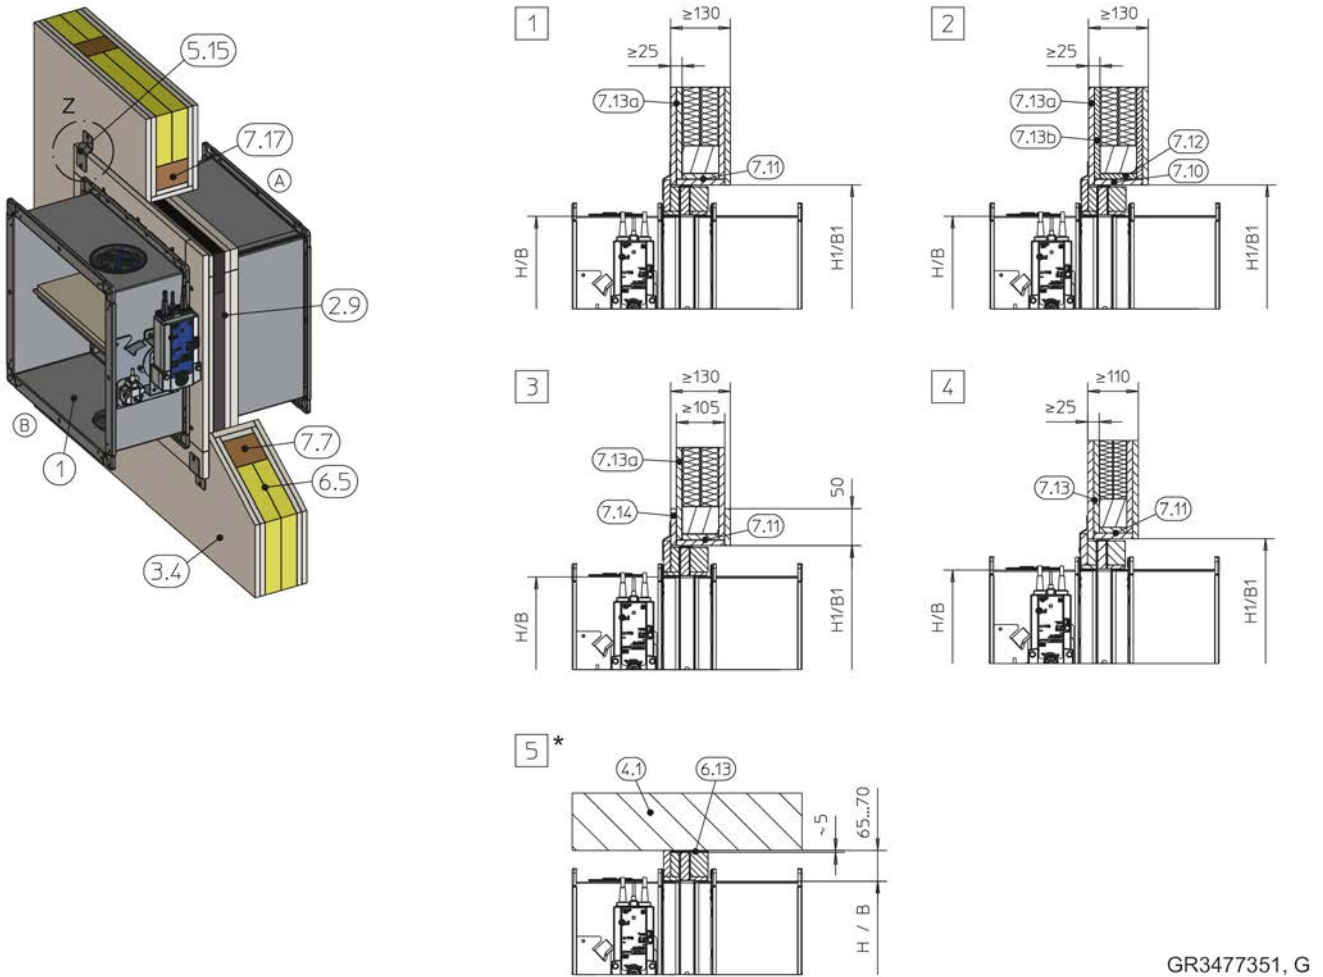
Mortar-based installation – 4-way arrangement with common duct
